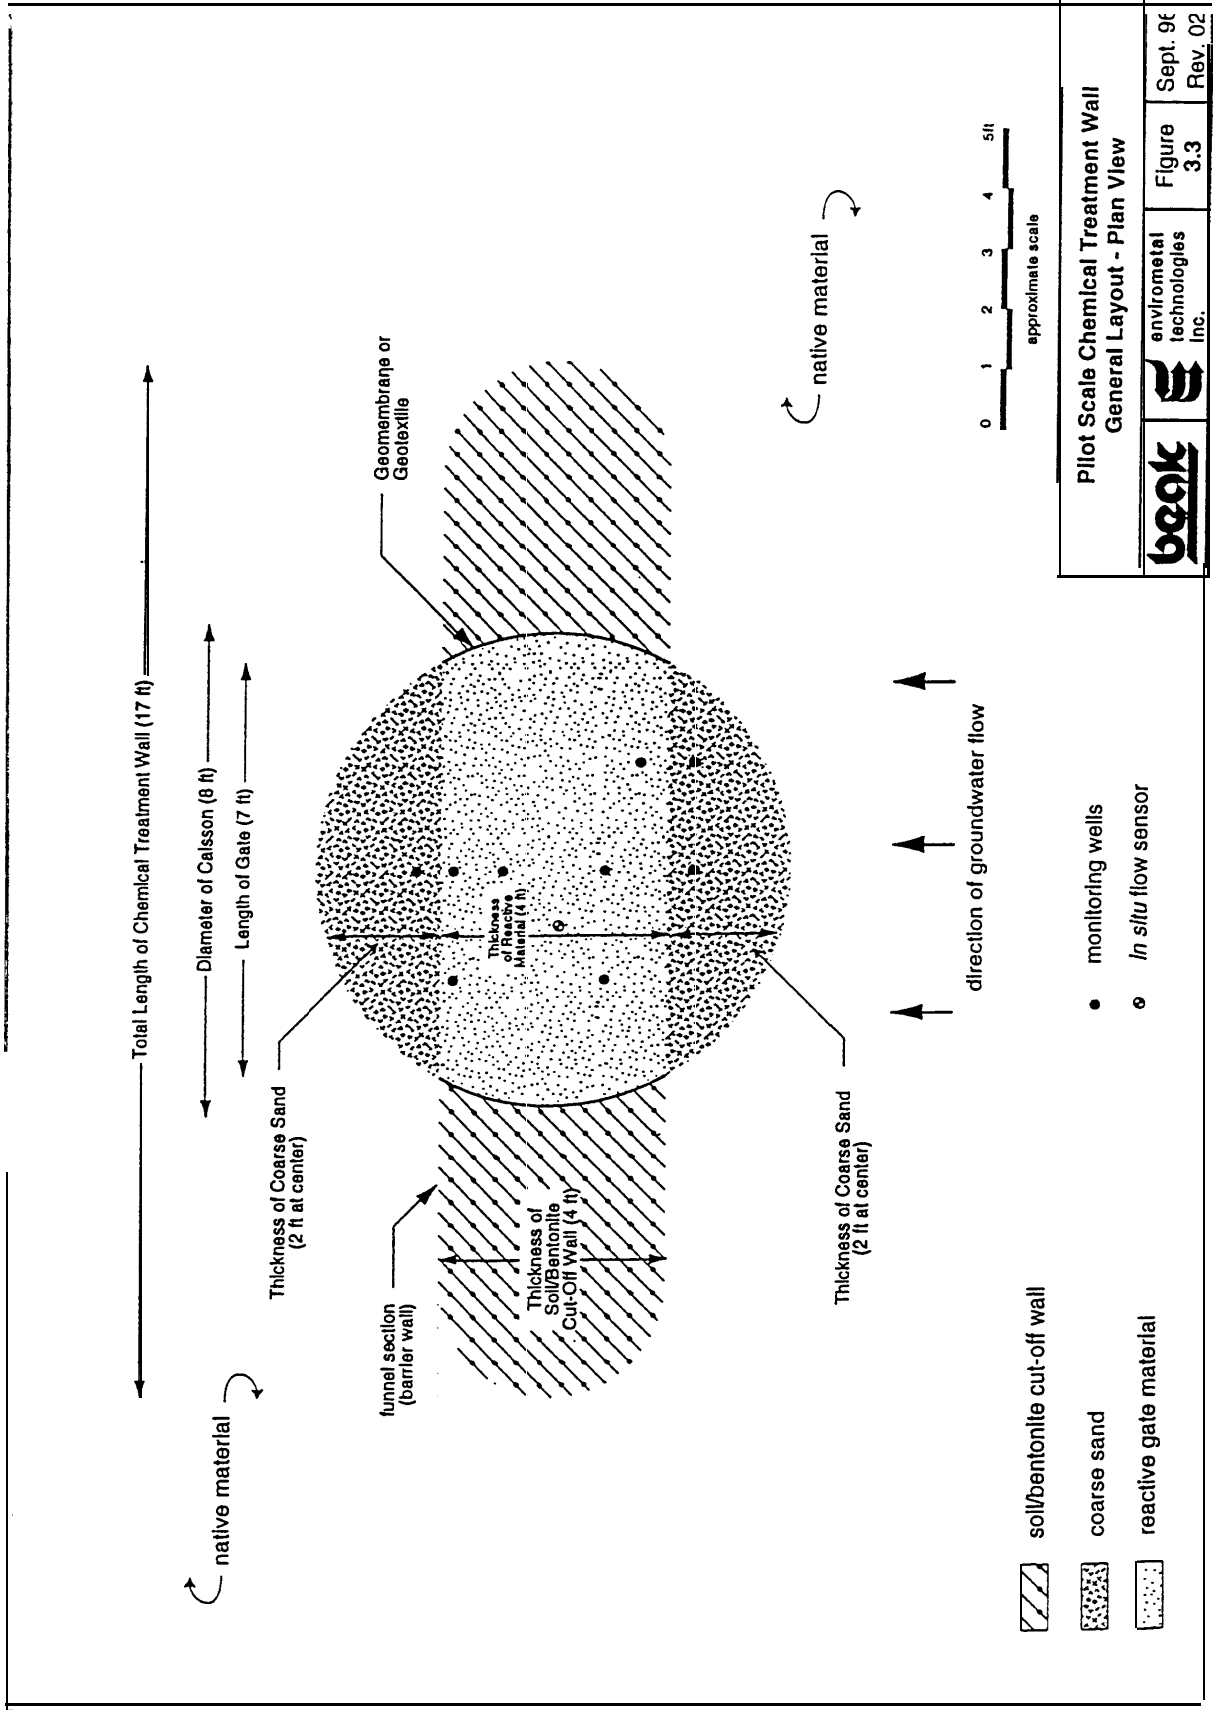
Design Plan for the Permeable Barrier Installed at the Somersworth Sanitary Landfill, NH – Plan View (ETI, 1996)
